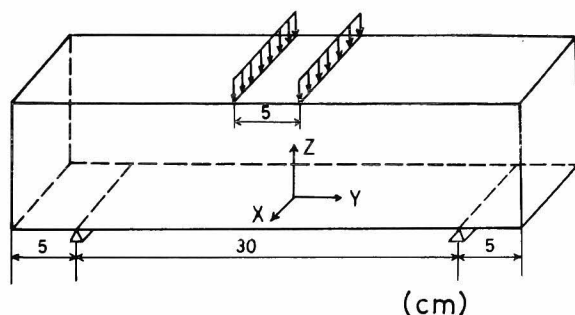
Sketch of the reinforced concrete beam specimen.
